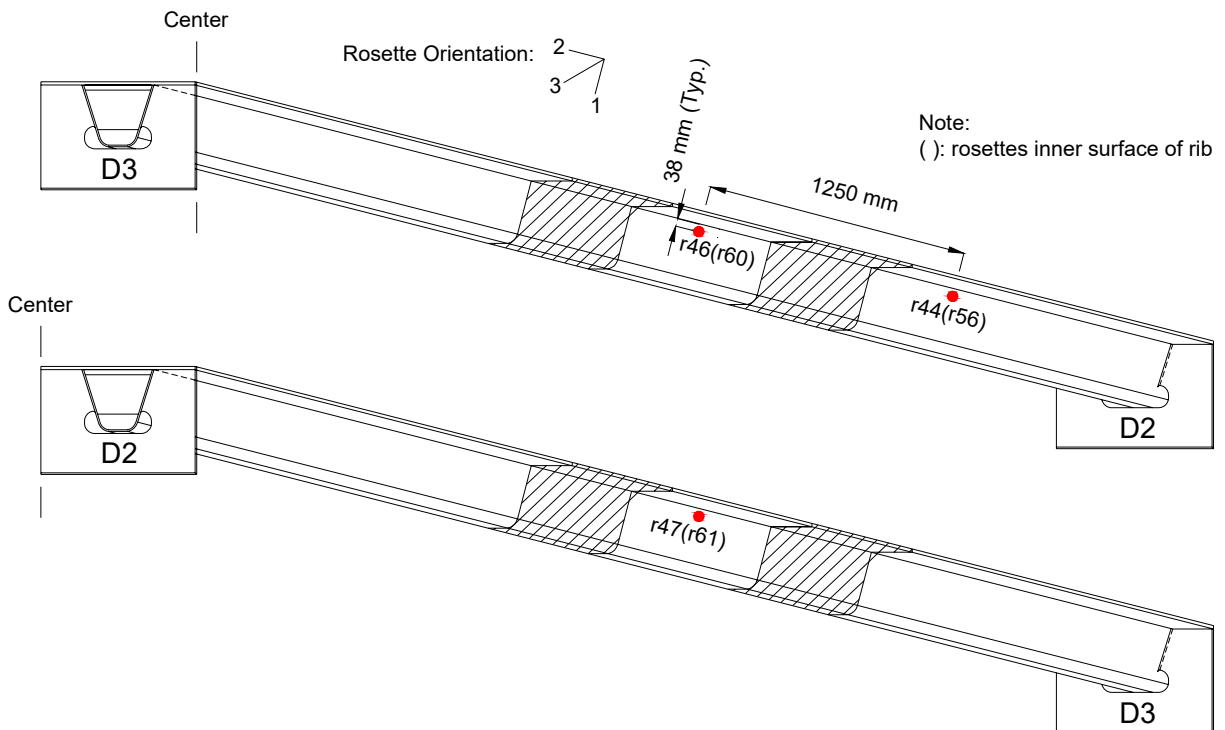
Specimen 1: Strain Gages in Rib R3 near Rib-to-Deck Welds
